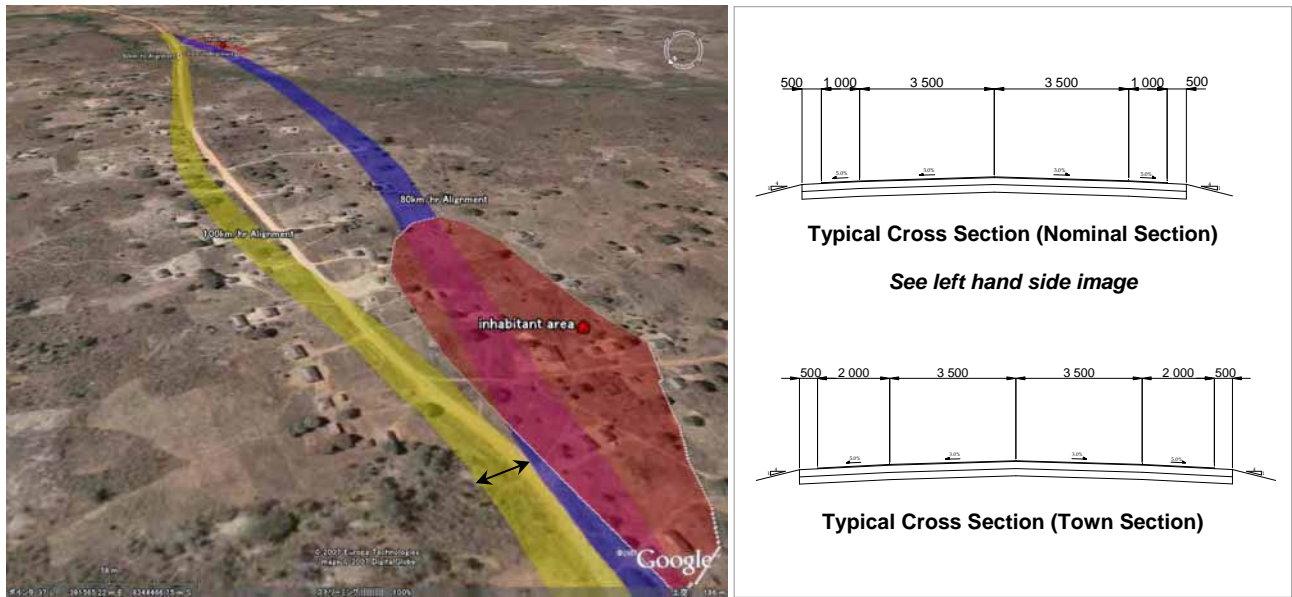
Typical image of Affected Structures by Road Expansion at change 169kms Point (Rural Area Section)
